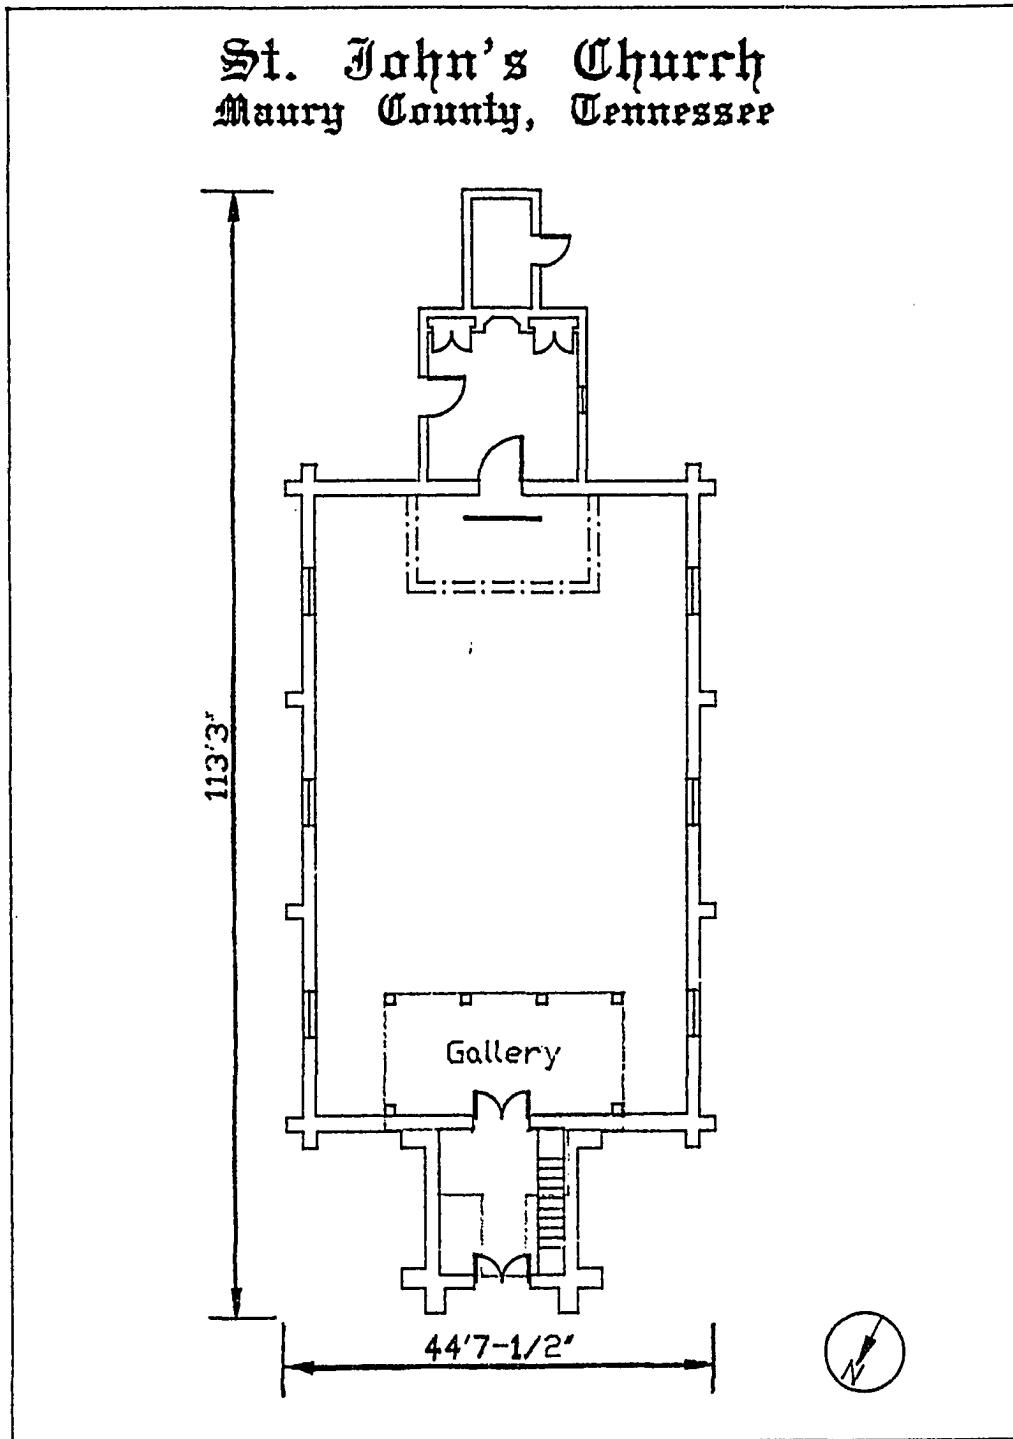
AutoCADD drawn floorplan of St. John's Episcopal Church.
